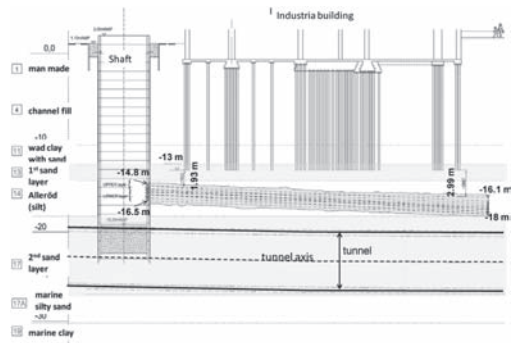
Cross-section installation shaft, pile foundation and TAM positions in the Amsterdam subsoil at the Rokin pre-grouting trial. Only the upper TAMs were used.
